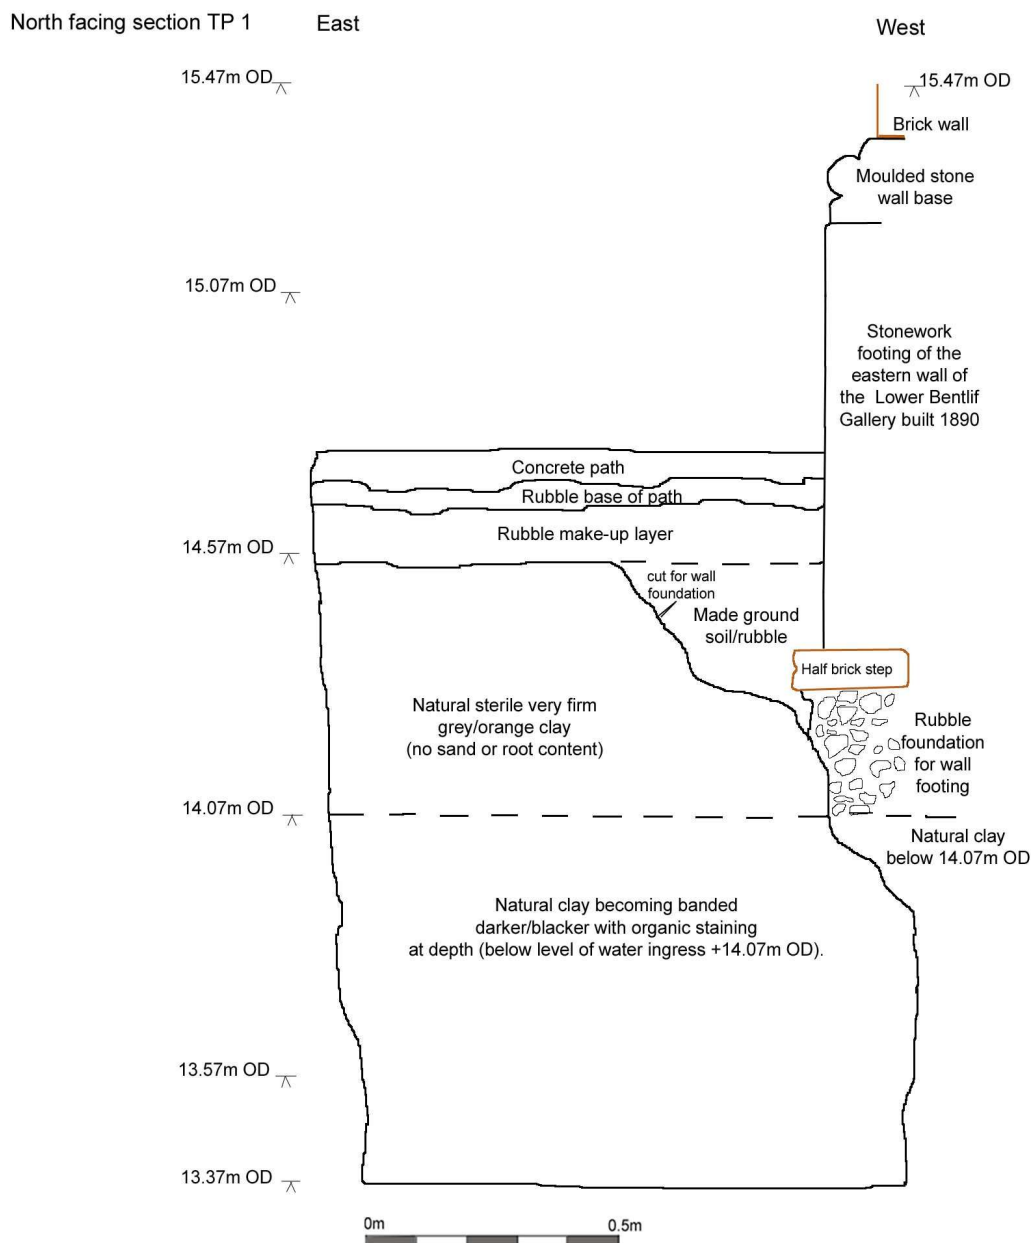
Section through Test Pit 1 showing the south elevation (north facing section)
